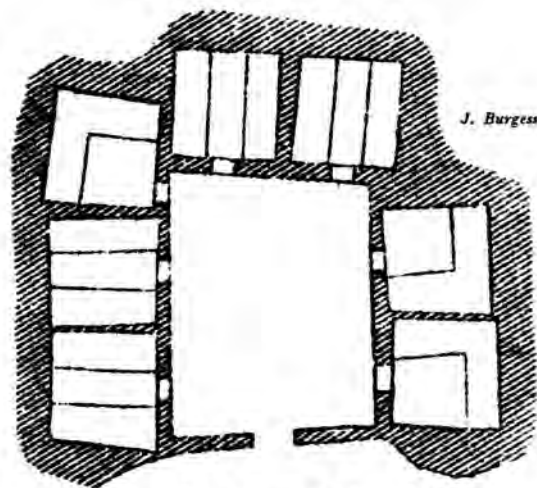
Ajanta Cave 12 plan and section (BCT 27)
